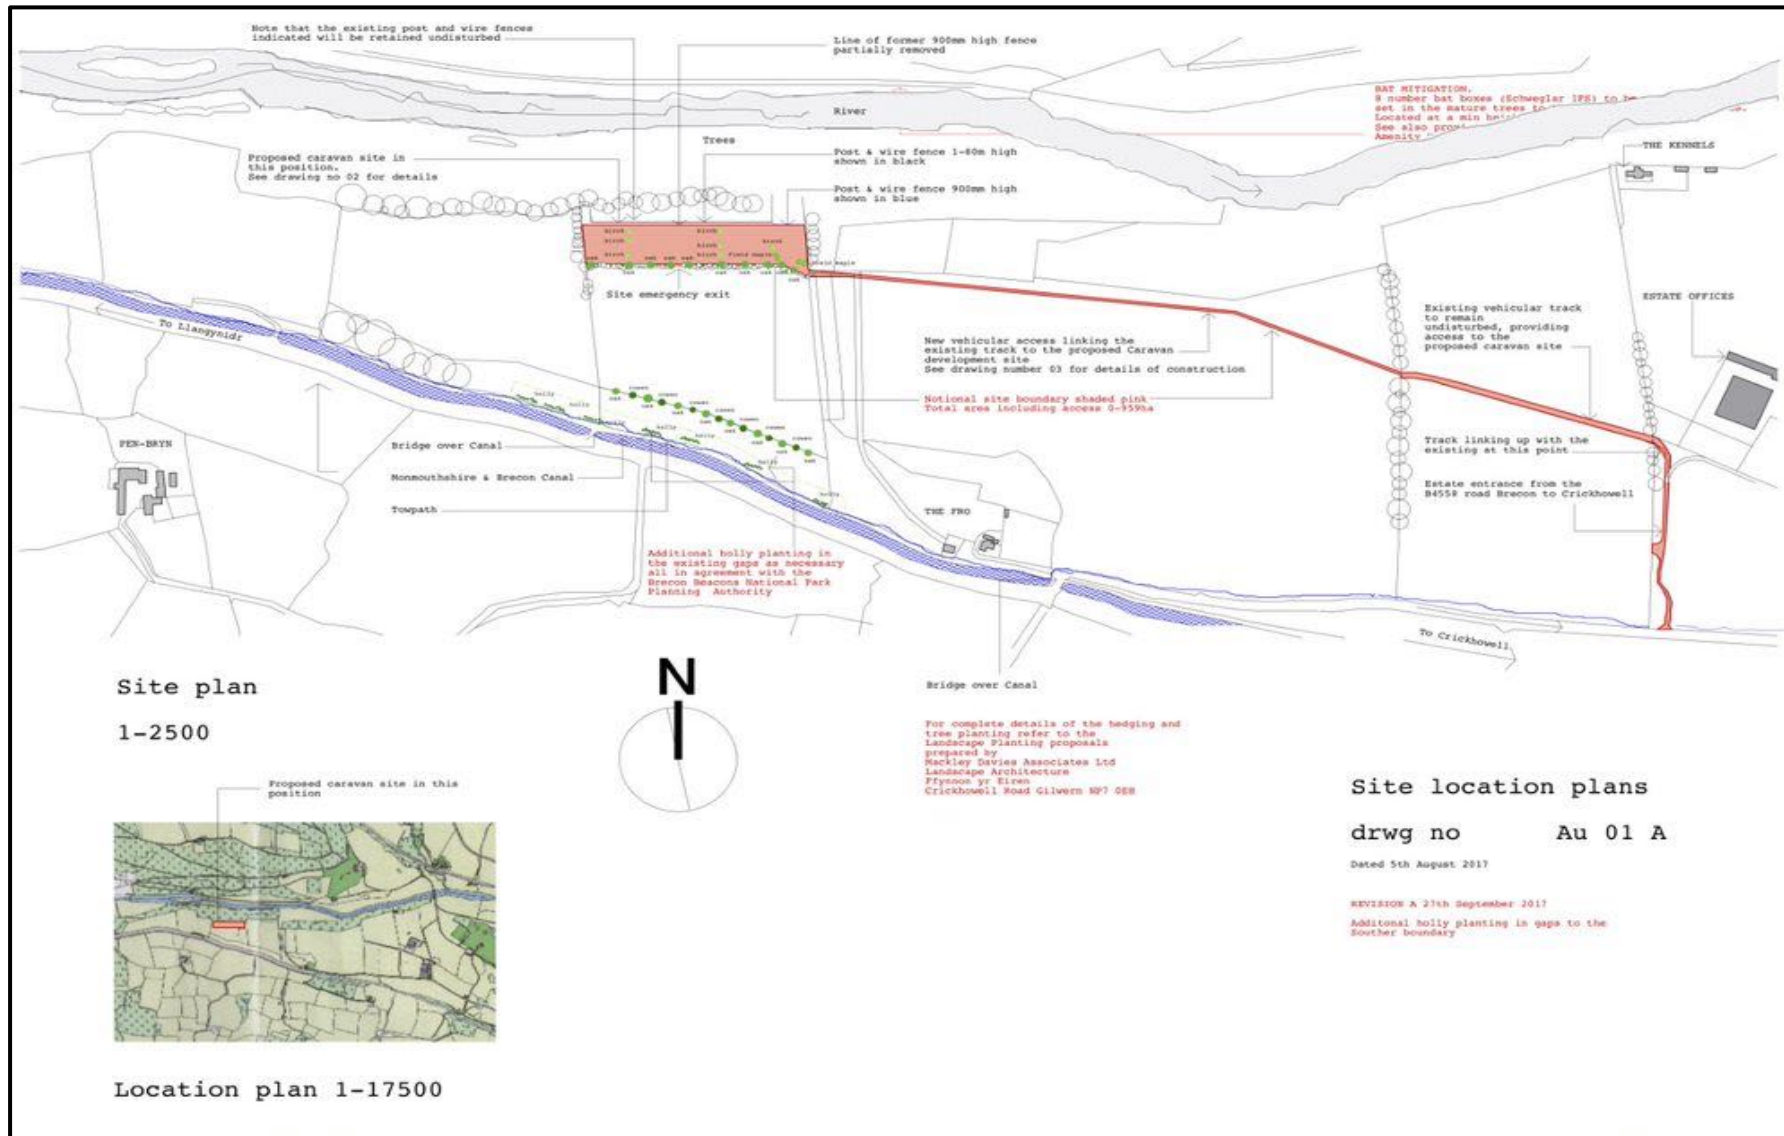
Plan showing location of development area and proposed groundworks and excavations
